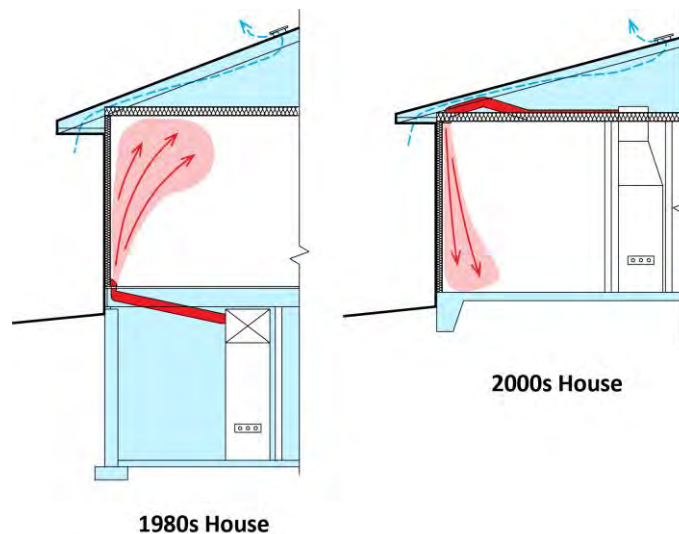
Two prolific ways of organizing conditioned, unconditioned, and HVAC systems: a house with a full basement, with HVAC equipment and distribution in the basement; and contemporary affordable housing, built on a slab with HVAC equipment on the occupied floor and distribution through the attic. These scenarios are introduced (respectively) as the 1980s and the 2000s house later in this paper.
